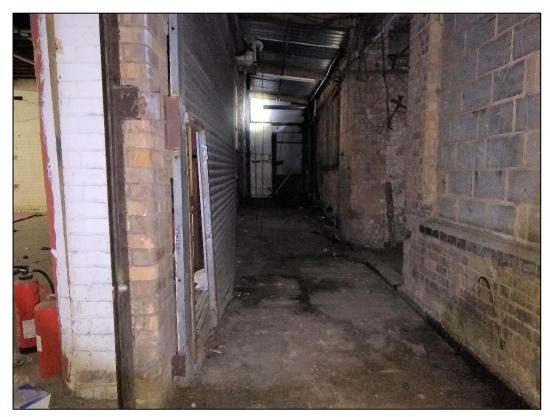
The corridor to the rear of No.33 Great Hampton Street (on right) between it and Building 1
